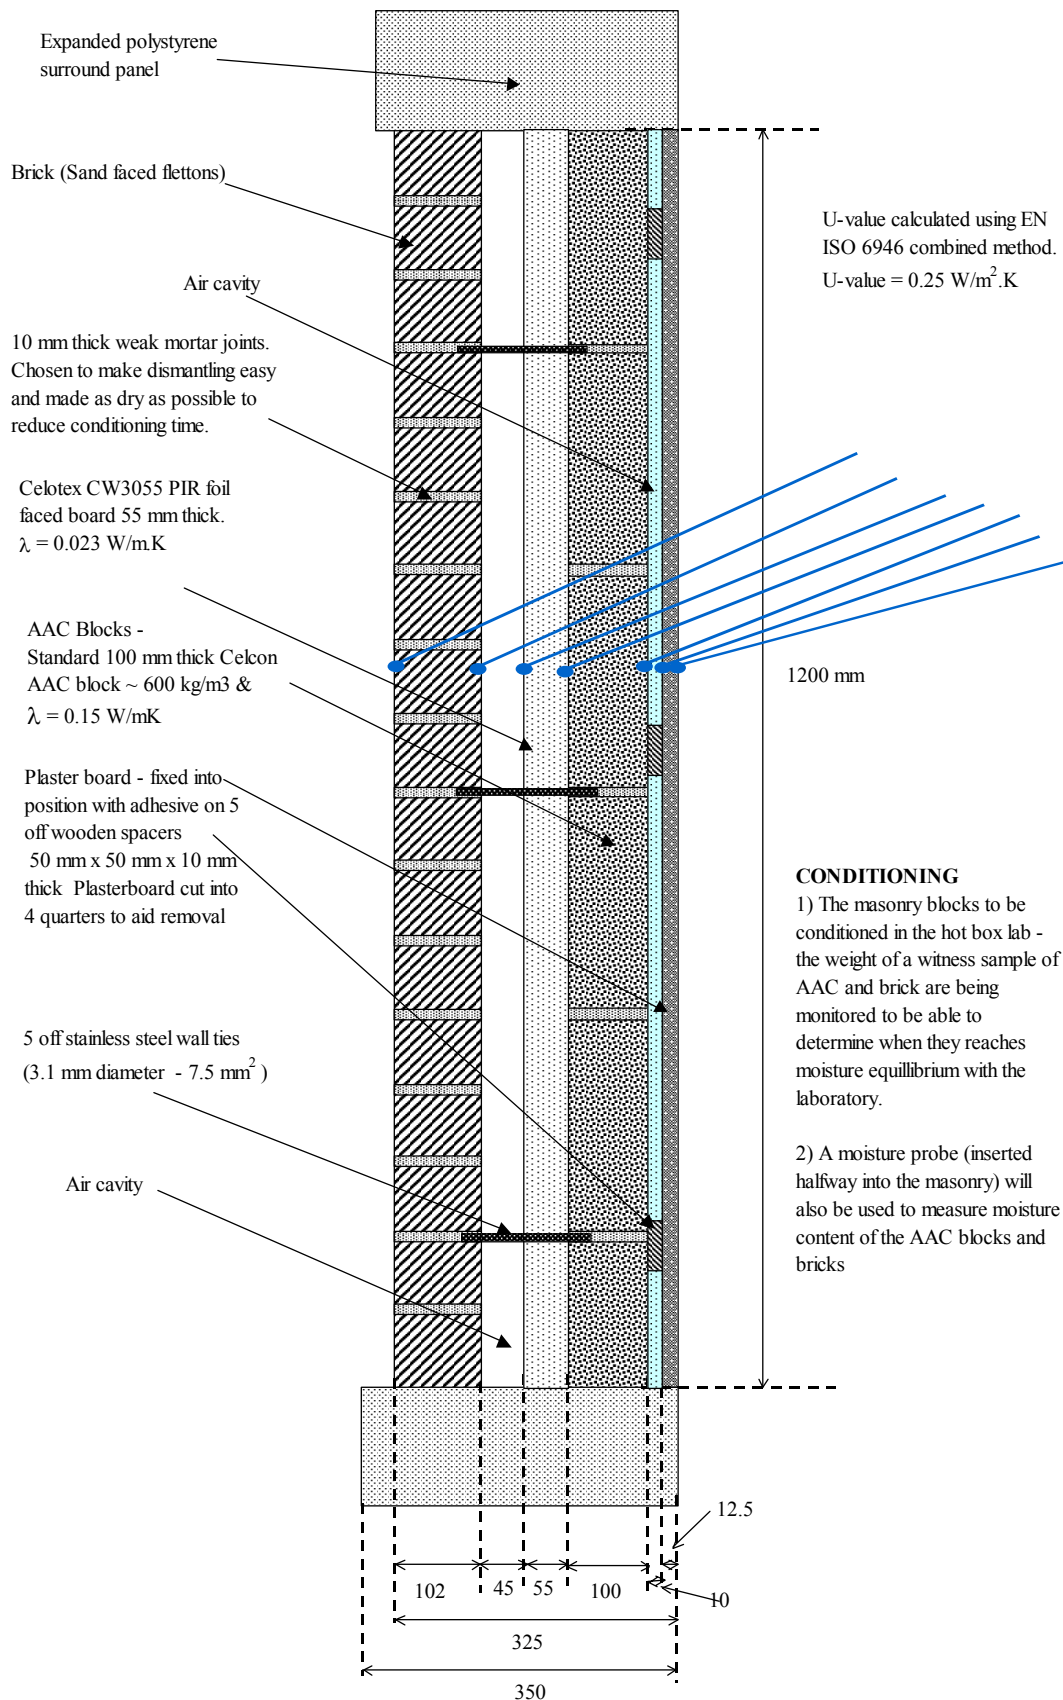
Drawing of Wall 3 – Brick/PUR/AAC
